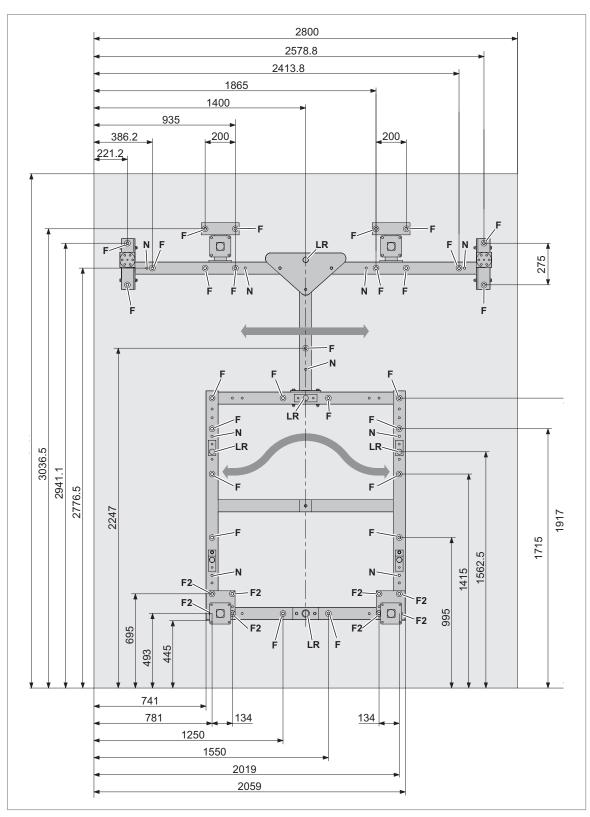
Foundation and empty conduit plan for base frame FURA-B (MPB with optional roof) – top view (dimensions in mm) F, F2, LR and N: 7 Page 39, Table 8
